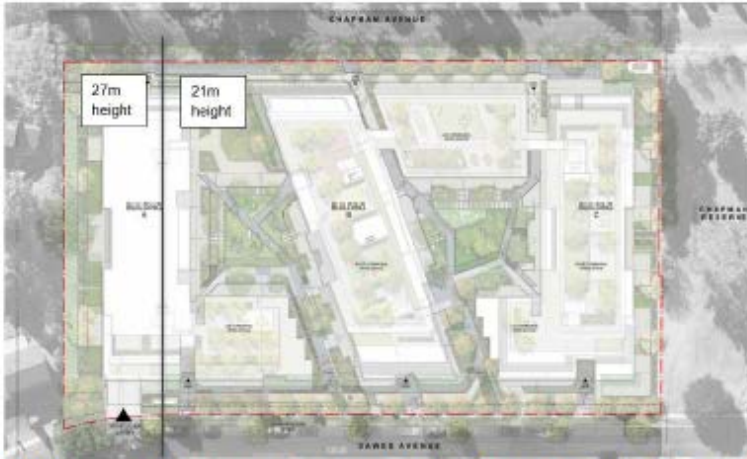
Site Plan showing location of Building A, B and C and split in height control
